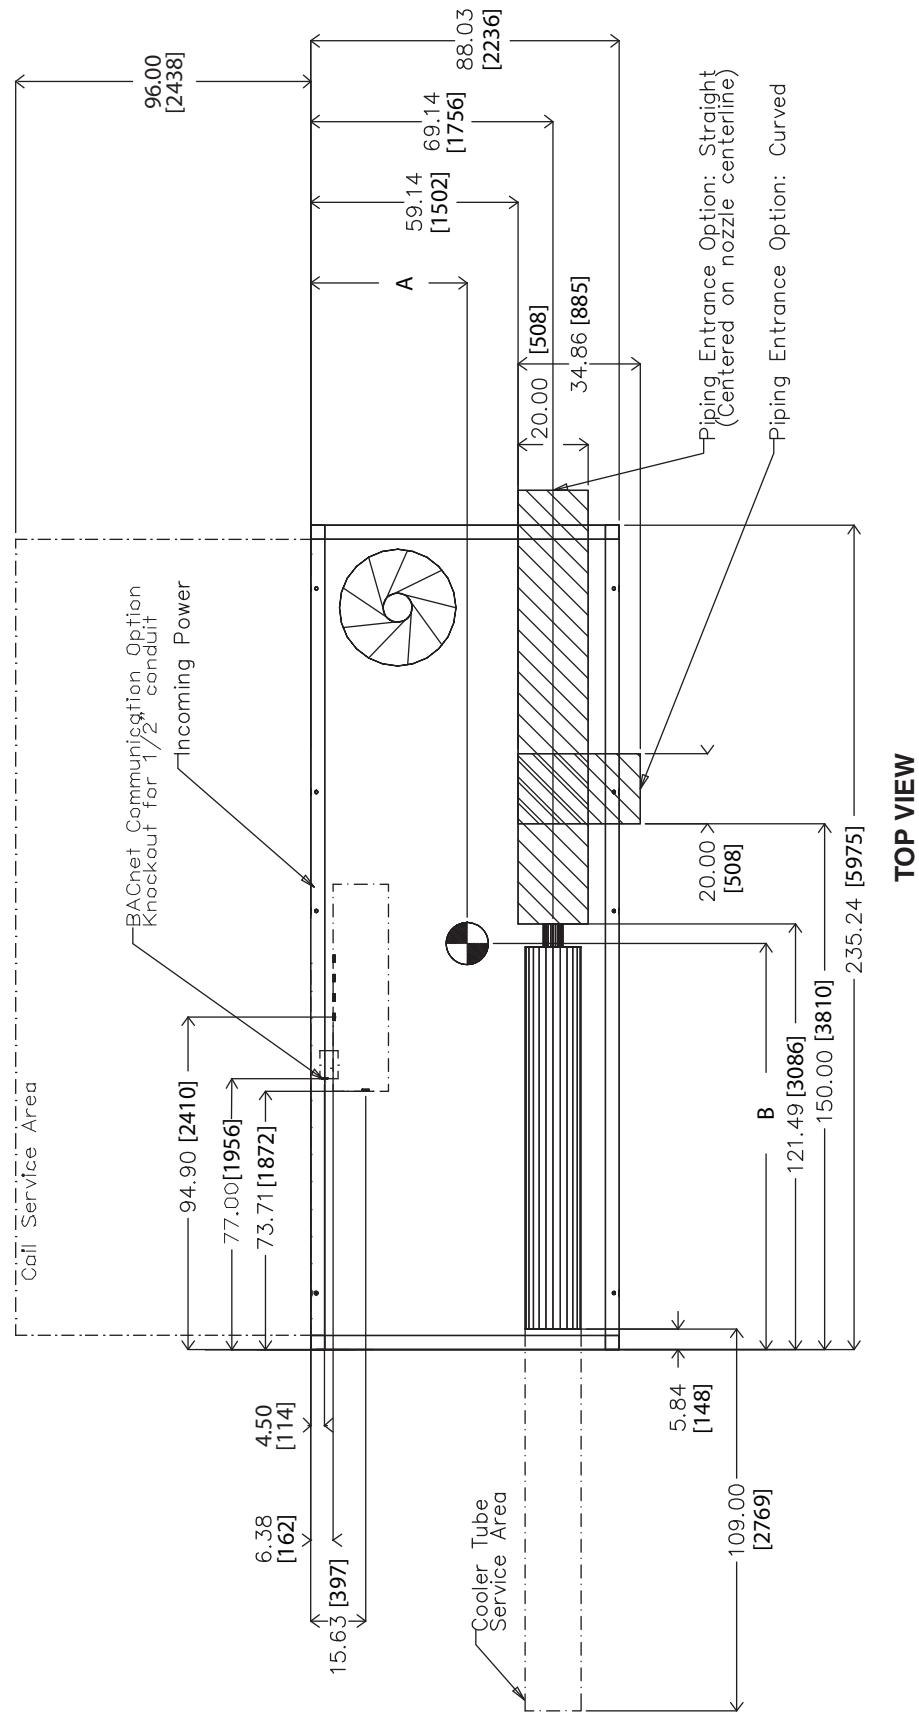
30XA112, 122 Air-Cooled Liquid Chiller Dimensions
